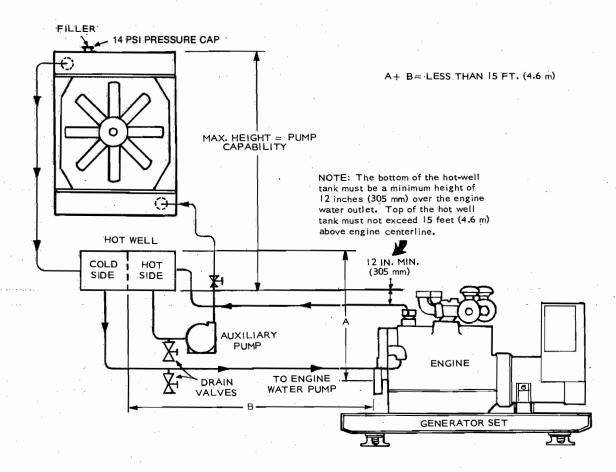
HIGH REMOTE RADIATOR INSTALLATION
